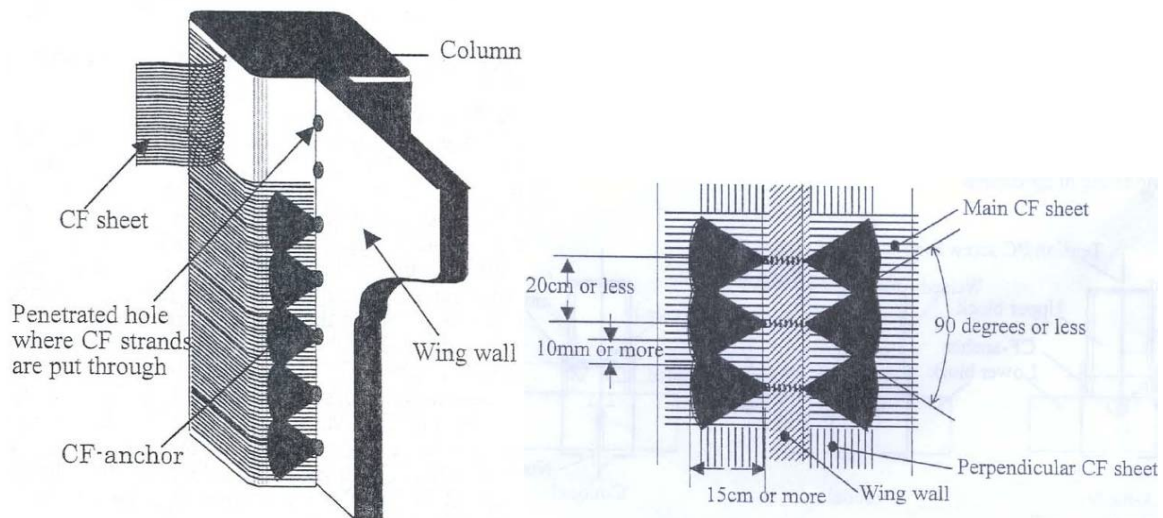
CFRP anchors for CFRP wrapping the column with wing wall,
